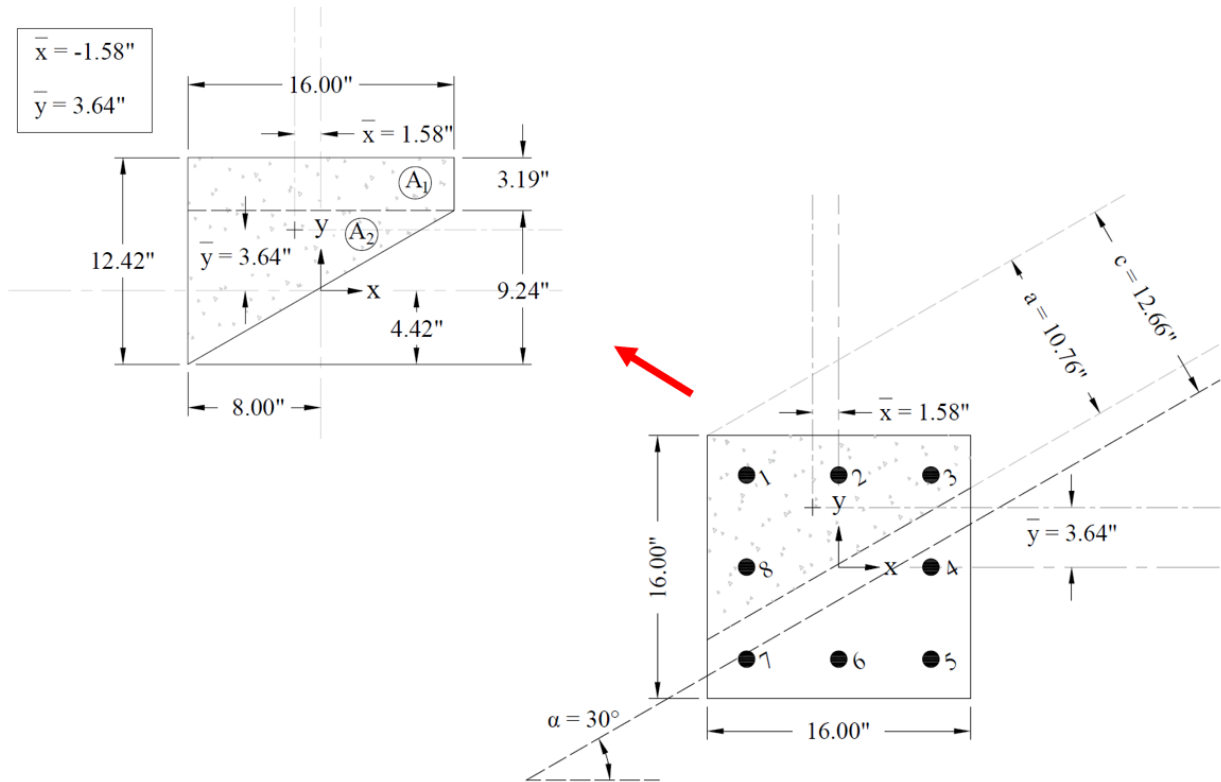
Cracked Concrete Column Section Centroid Calculations
